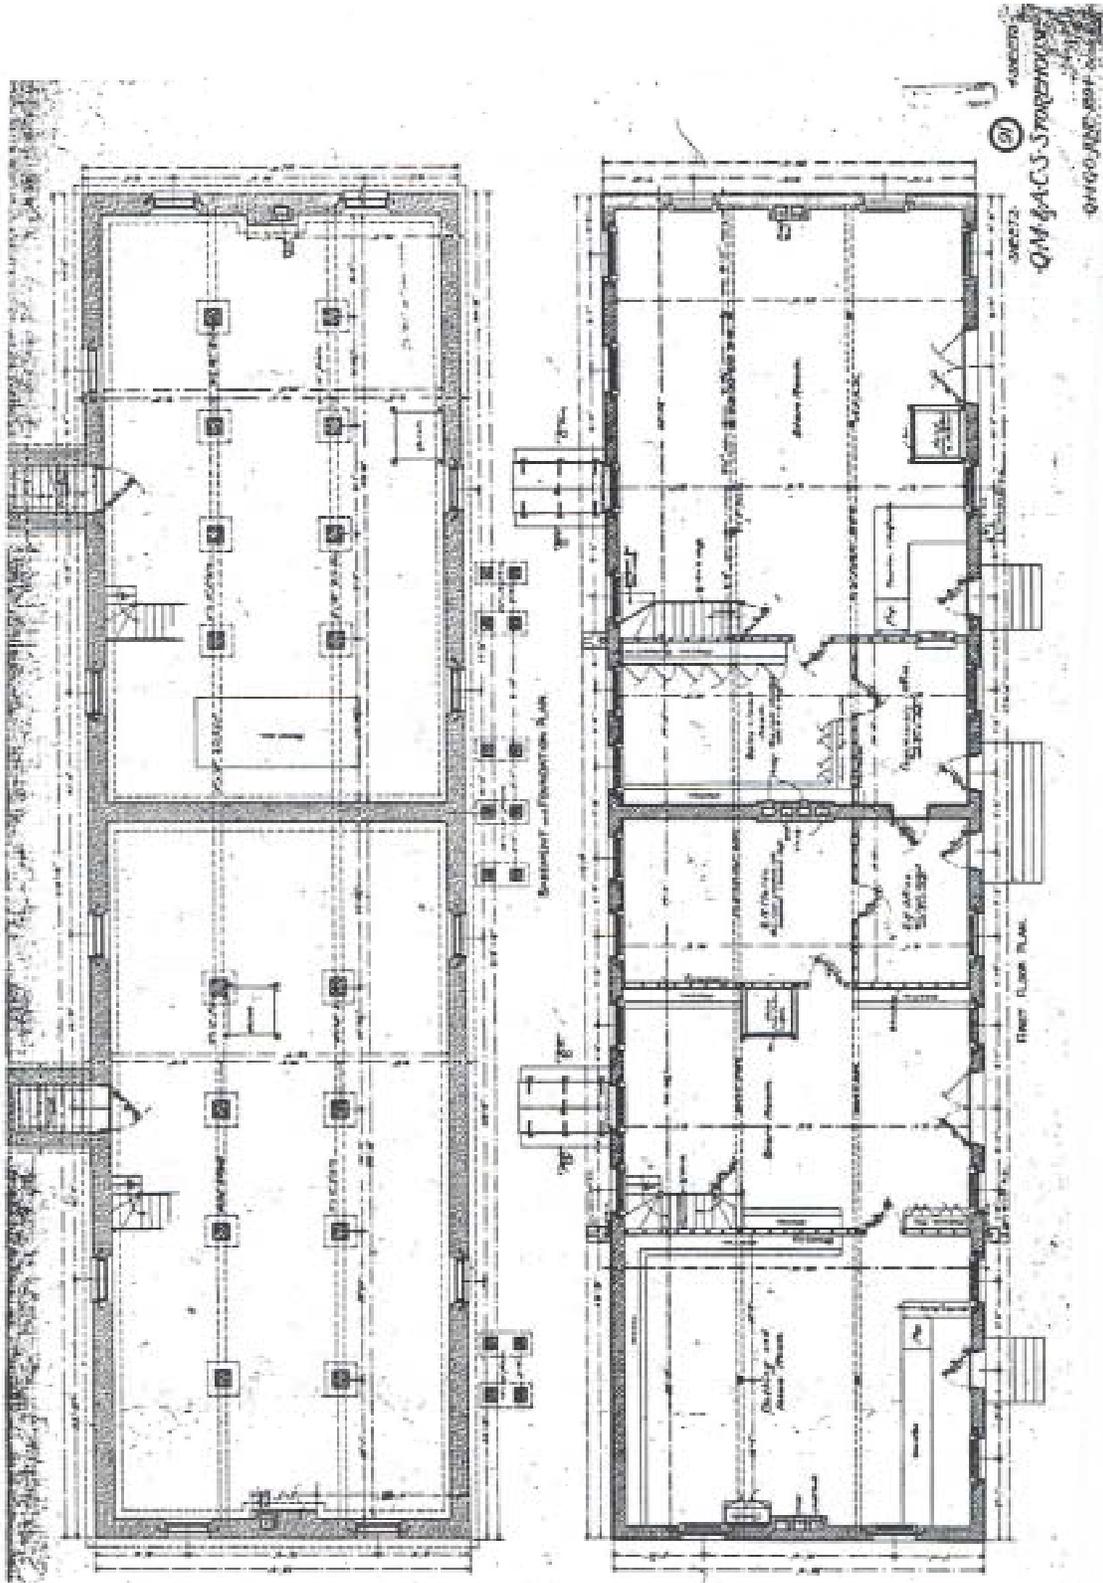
Plans, Quartermaster and Subsistence Storehouse, Plan no. 91, June 1894 [sheet 2 of 4].
